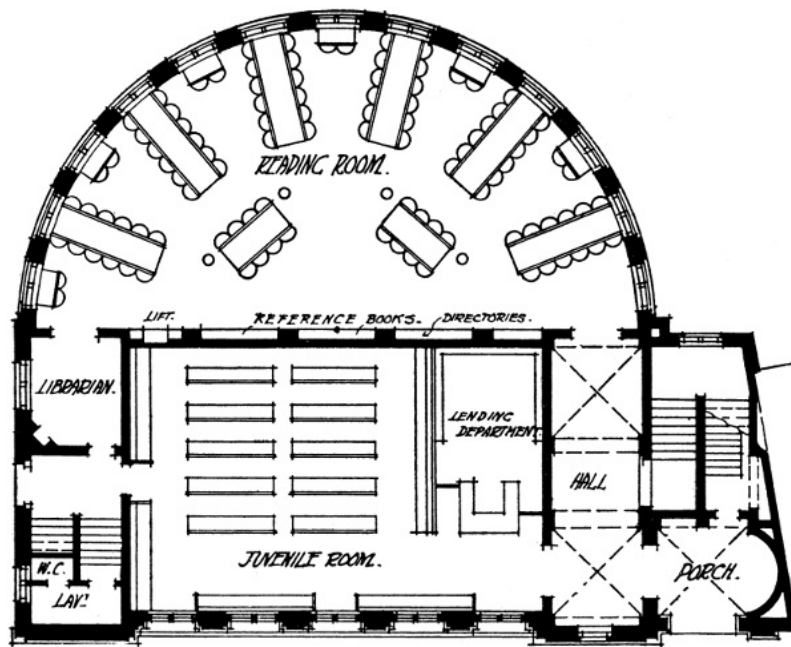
North Islington Library, with Reading Room on Ground Floor (Section 120).
